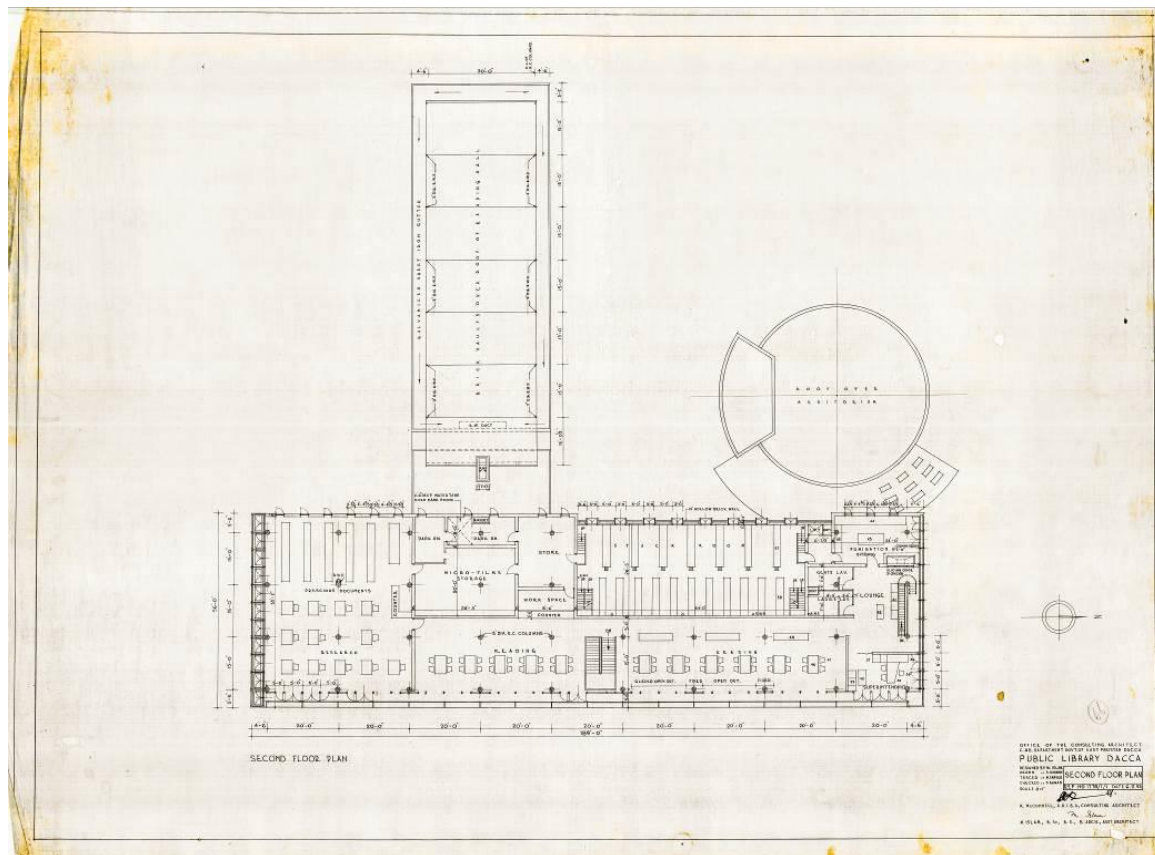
Second floor plan Office of Consulting Architect. CBB Department of Cont. Of East Pakistan Dacca. Public Library, Dacca.
